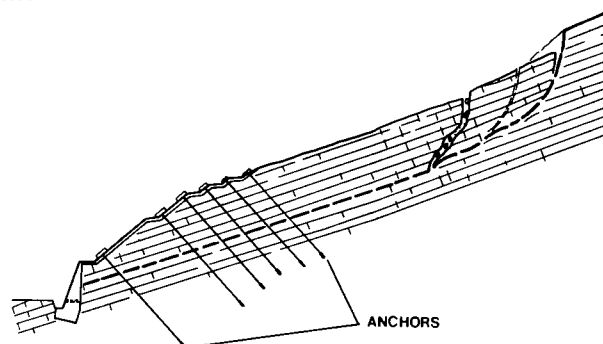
Placement of rock anchors for slope stabilization (modified from Zaruba and Mencl, 1982).
